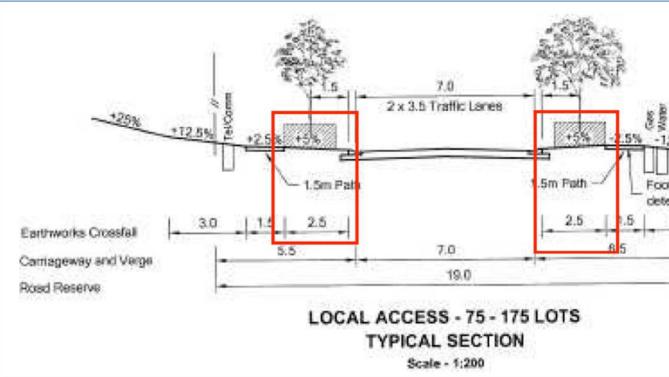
Extract from PSP No. 2 – Engineering Standards – Roads and Drainage Infrastructure
